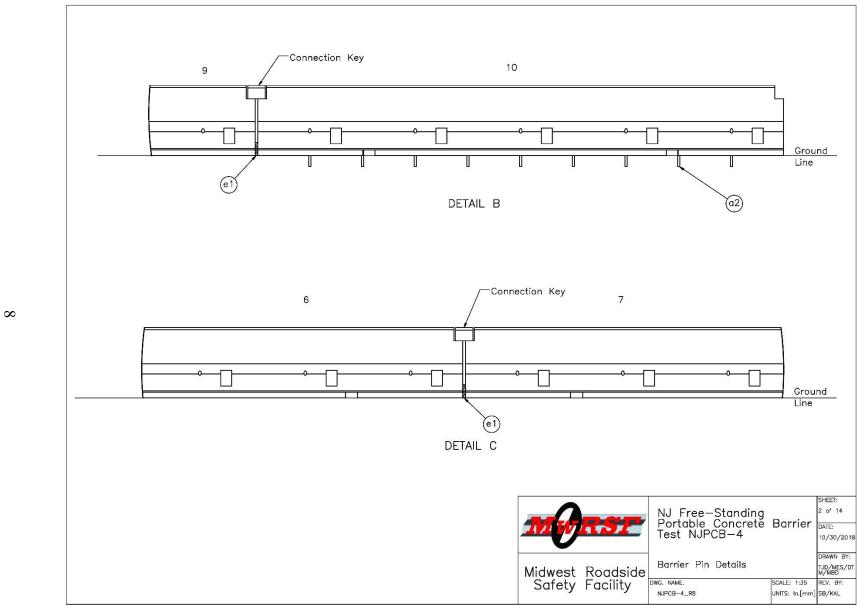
PCB Pin Anchor Details, Test No. NJPCB-4
